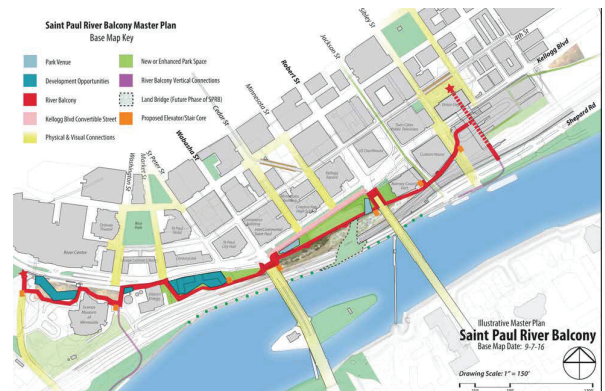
River Balcony Master Plan. Proposed connection from Union to Lower Landing.
